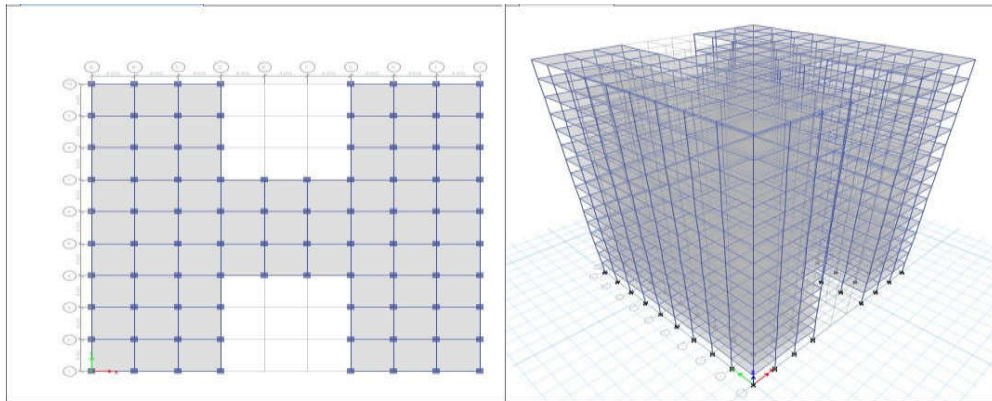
Assigning Beams, Columns, Slab to H Shape Building
